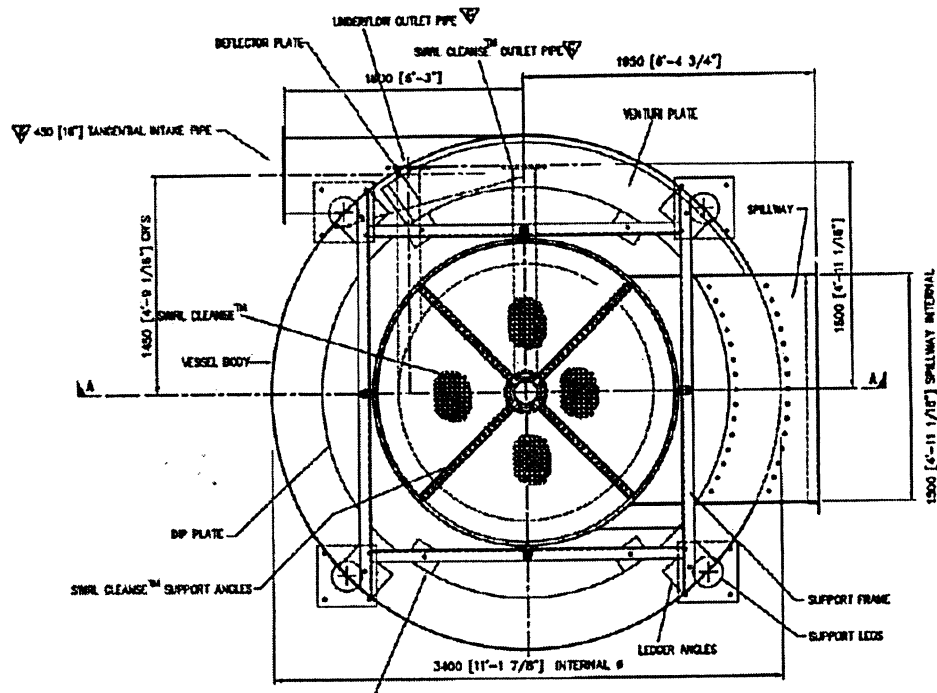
Plan View of a 3.4 m Diameter Storm King Unit (Source: Li, 2004)
